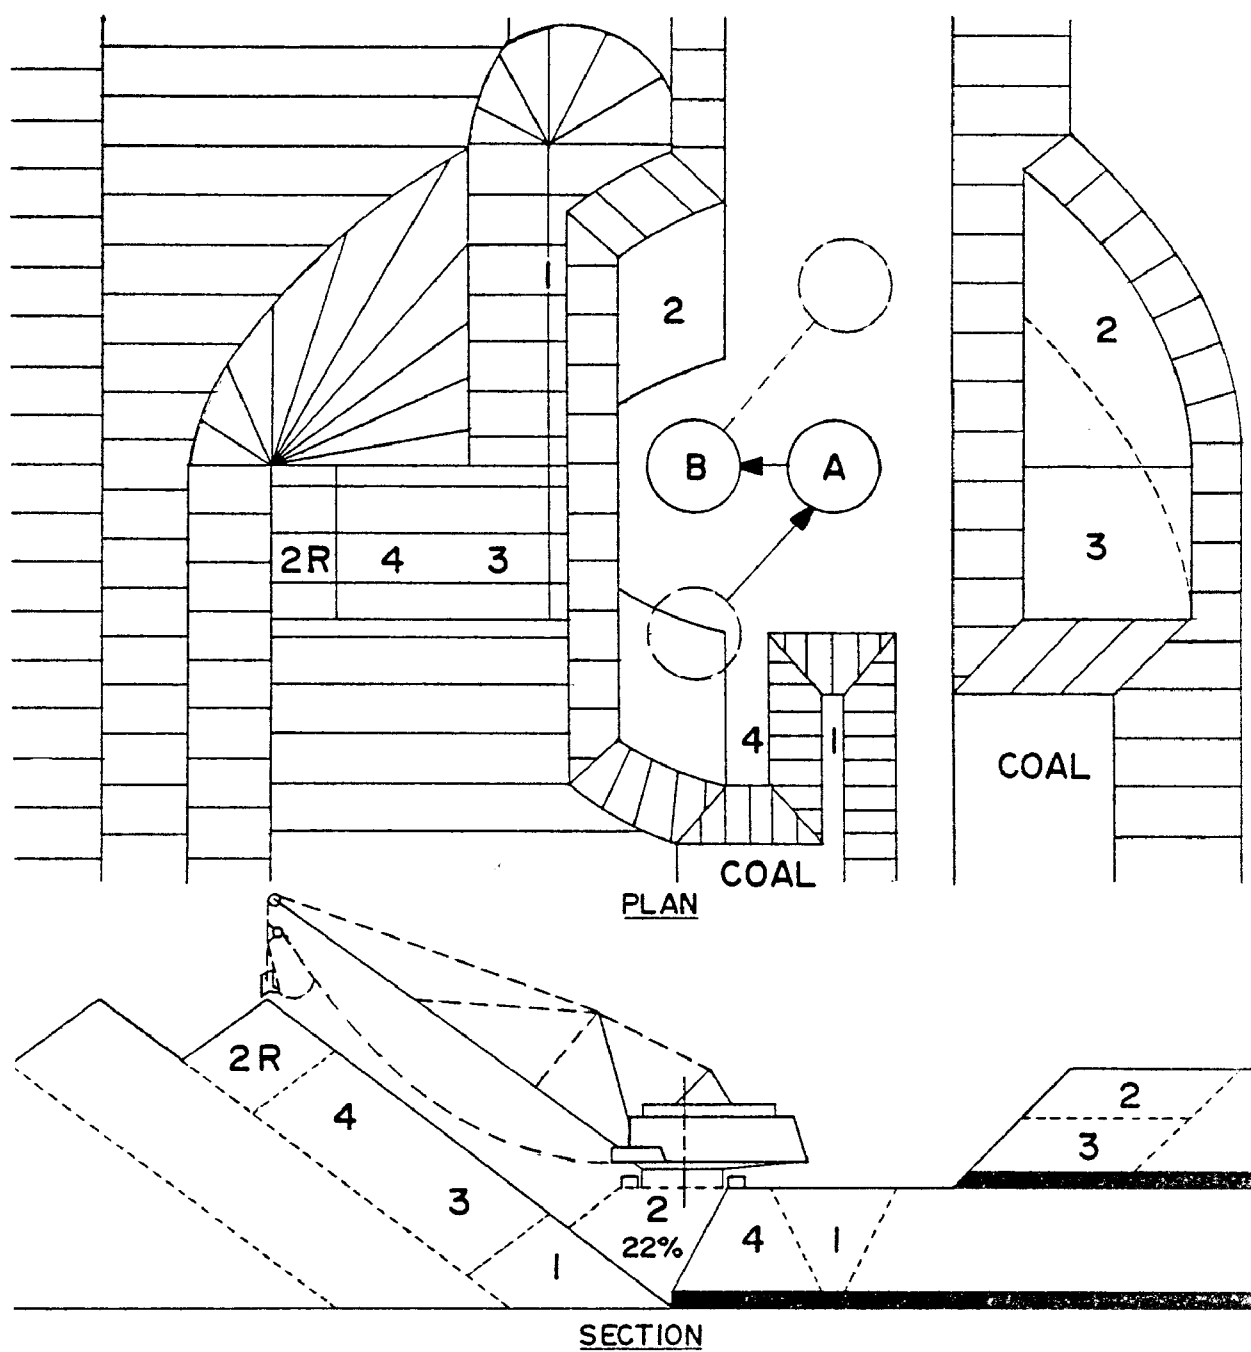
Single Pass Extended Bench Method for Stripping of Two Coal Seams
